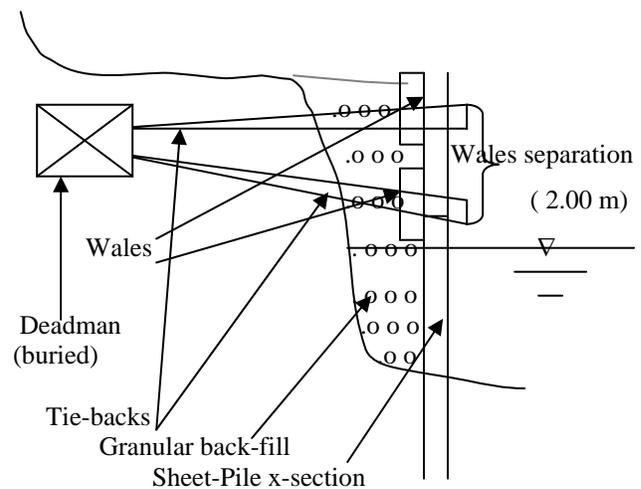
Schematic cross-sectional outline showing the vertical distances between tie-backs and Deadman-type anchors behind the sheet pile wall.
